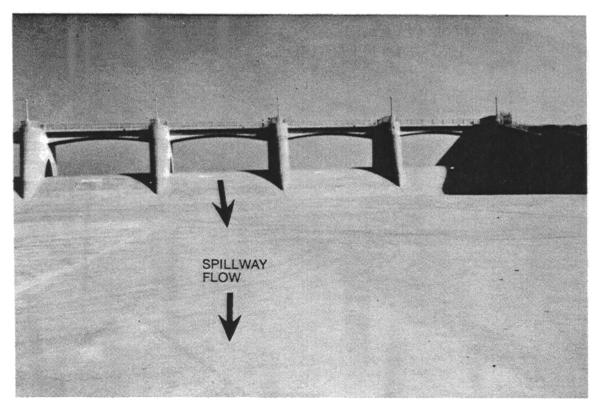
Spillway Apron (Spillway Outlet Channel), with portion of spillway in background (view from downstream, atop spillway apron).
